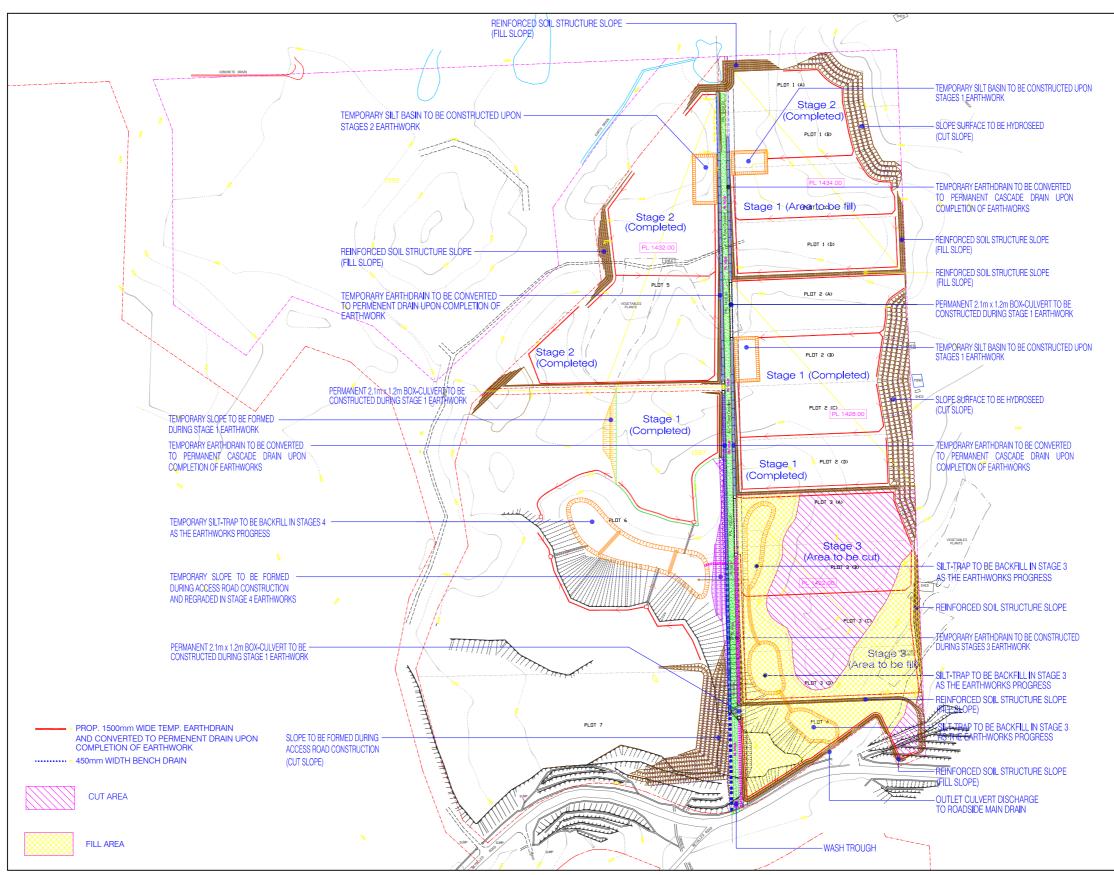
Stage 3 ESC Plan for Proposed Development Area (Deng Seng, 2004).
